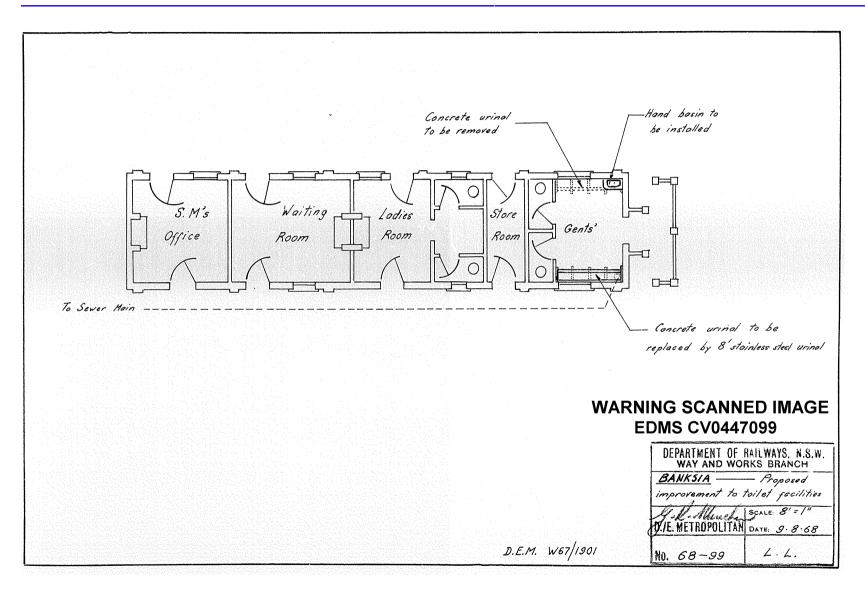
Banksia Station Male Toilets located in station building 2/3, c. 1968 (Source: Sydney Trains plan room)
